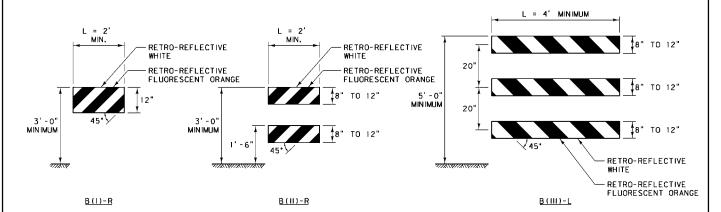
DETAILED DRAWING REFERENCE DWG. NO. 617-08 SECTION 617
